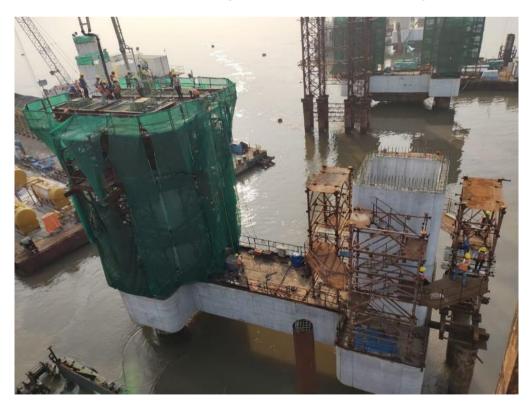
Concreting of Pier Cap - MP 148 South in progress
